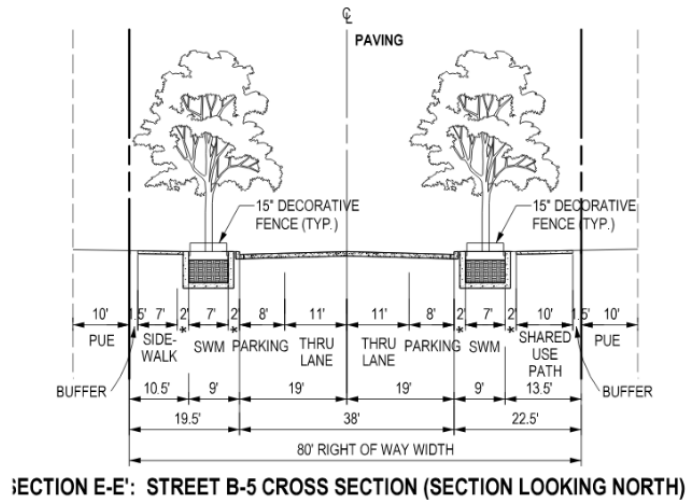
Approved Street B-5 Cross Section, Preliminary Plan No. 120180240
